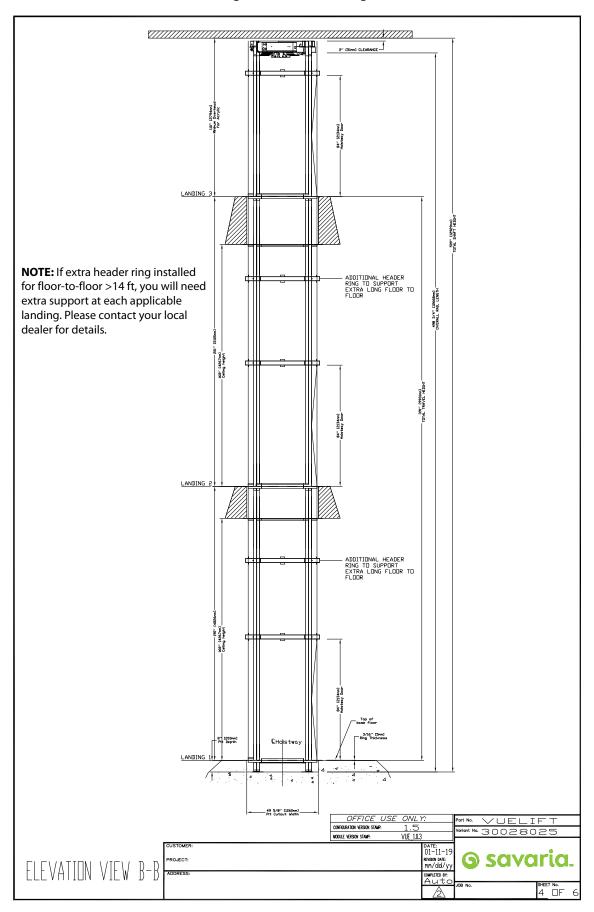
Elevation view (RAM) - extra header rings if floor-to-floor height > 14 ft
